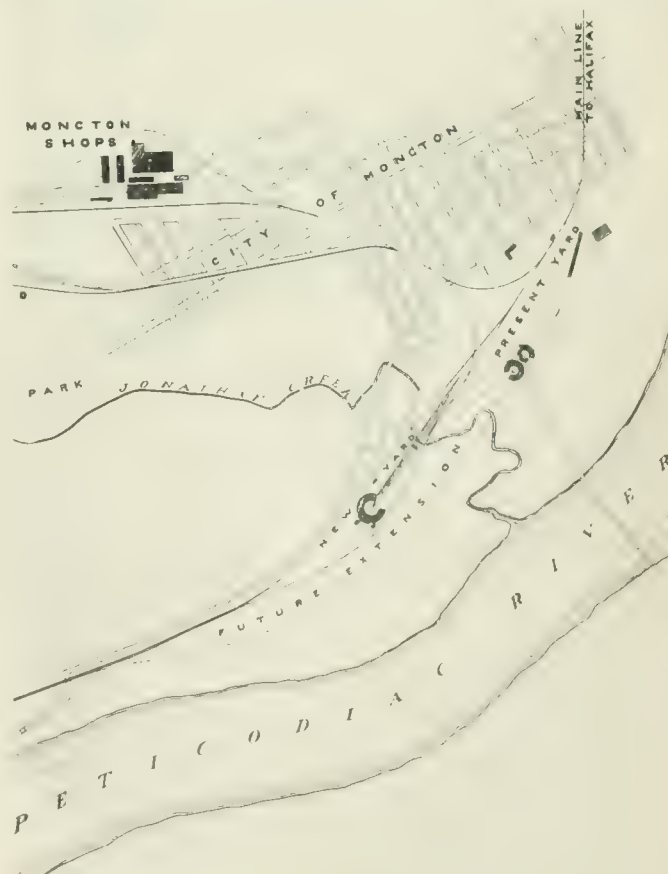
Plan of Moncton Yard Layout with Approaches
